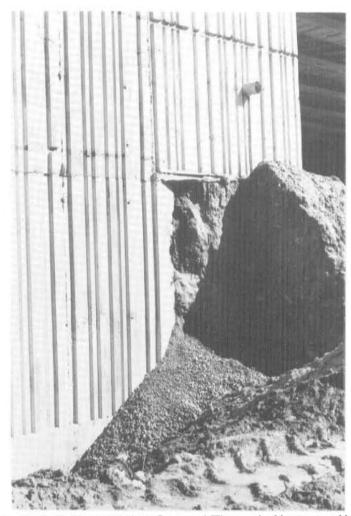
Backfill Material that Seeped Through Abutment Wingwall.
